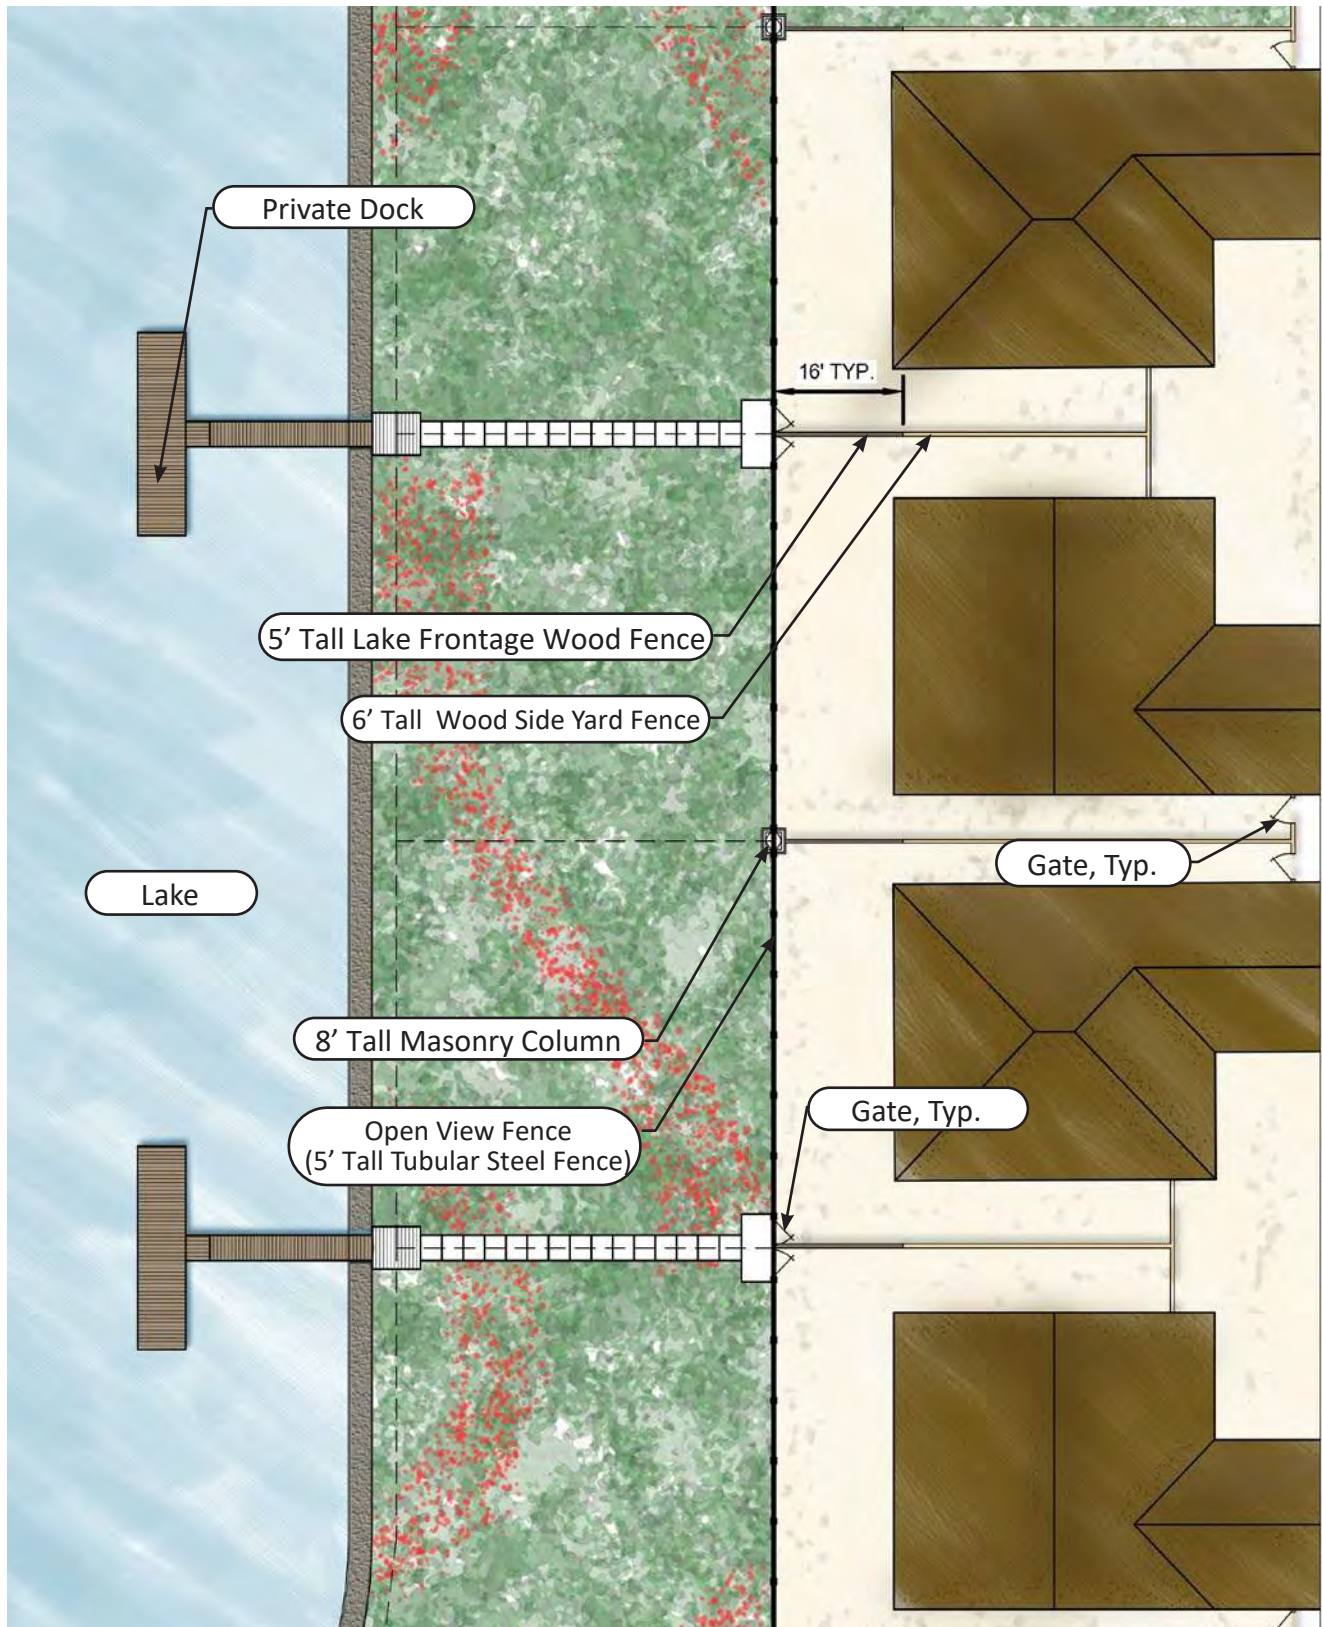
TYPICAL LAKE FRONTAGE FENCING LAYOUT
